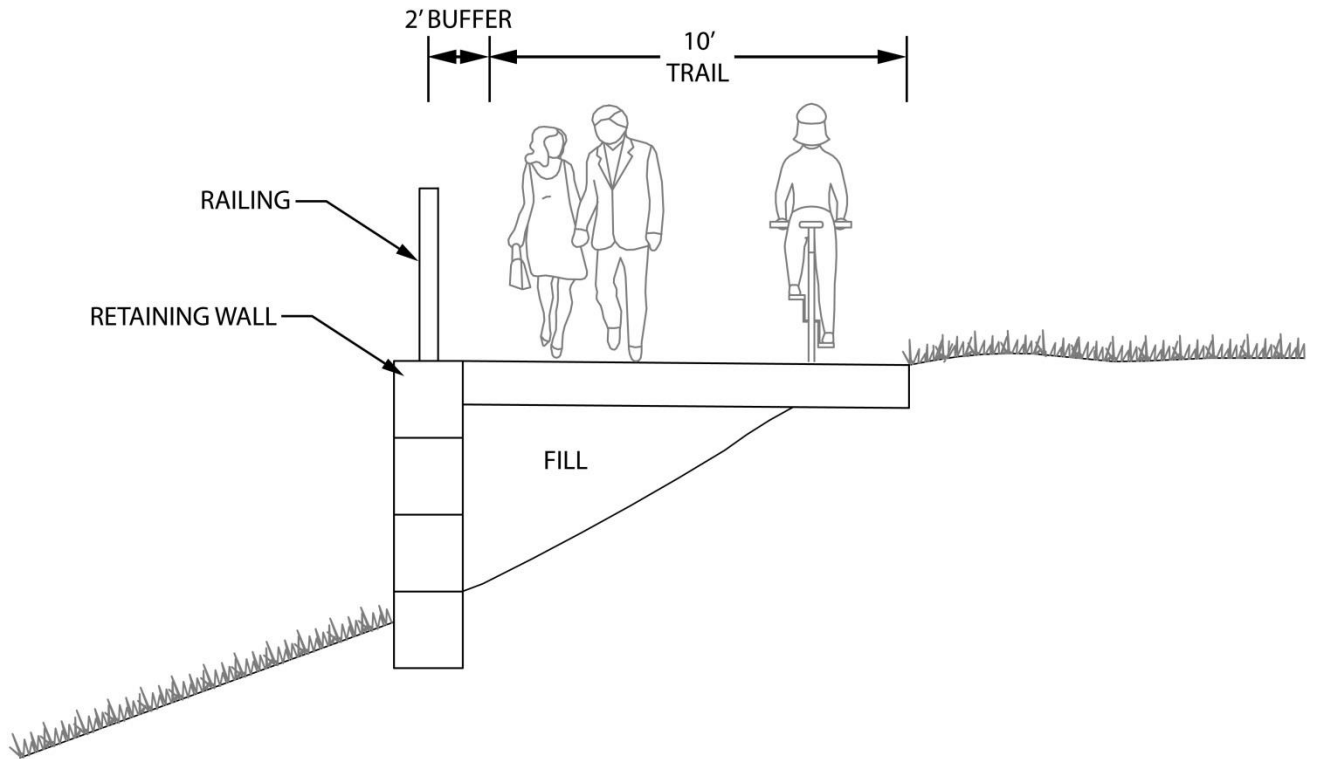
Typical raised Old Cameron Run Cross Section with Retaining Wall
